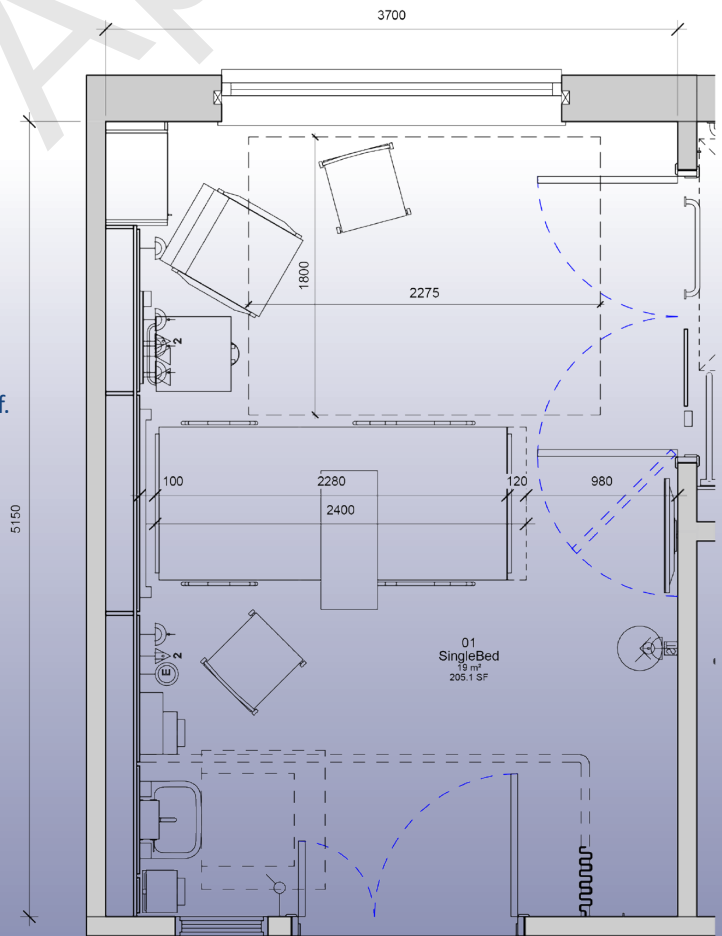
Nested Single Bedroom Repeatable Room Arrangement (not to scale)
